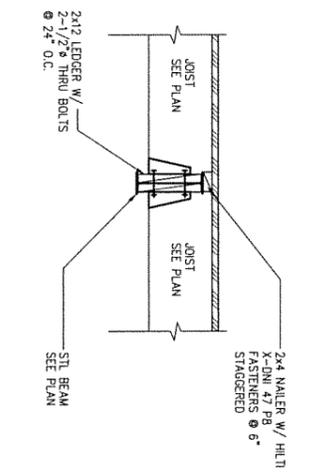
DETAILS SCALE TO 3/8" = 1'-0" IN 11X17 SHEET
